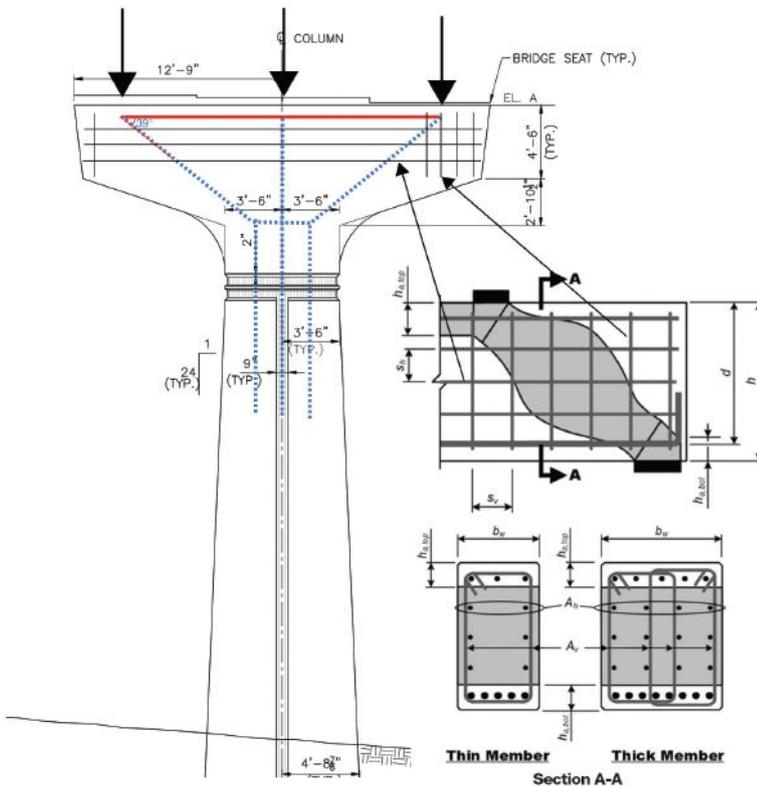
Strut-and-tie model for a hammerhead pier cap with inset illustrating the generalized concept of the strut and reinforcement details. Figure: Michael Baker International.
